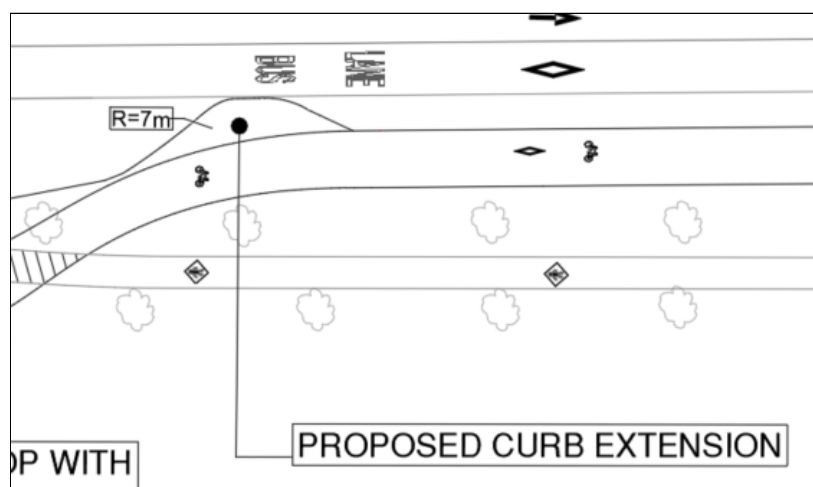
Curb Extension at South of SB Hampton Place Transit Stop
